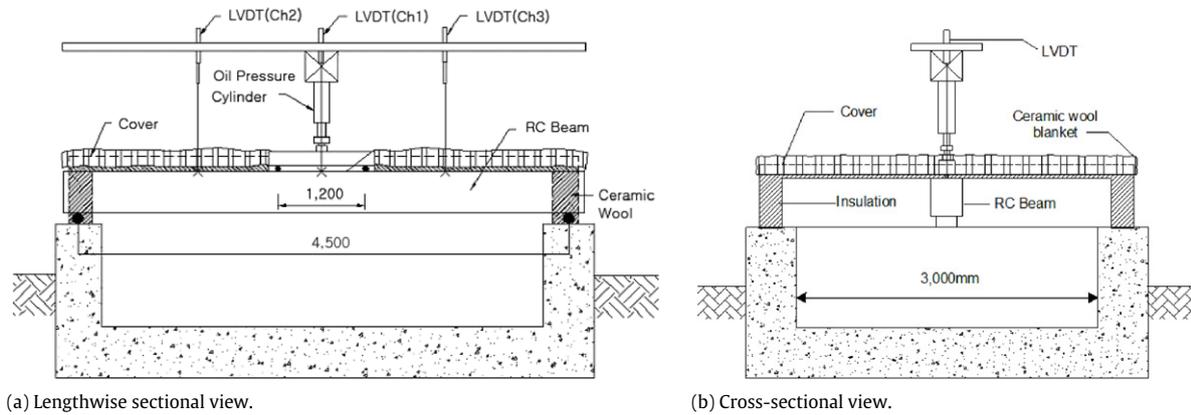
Test set-up of a beam in the fire chamber (unit: mm).
